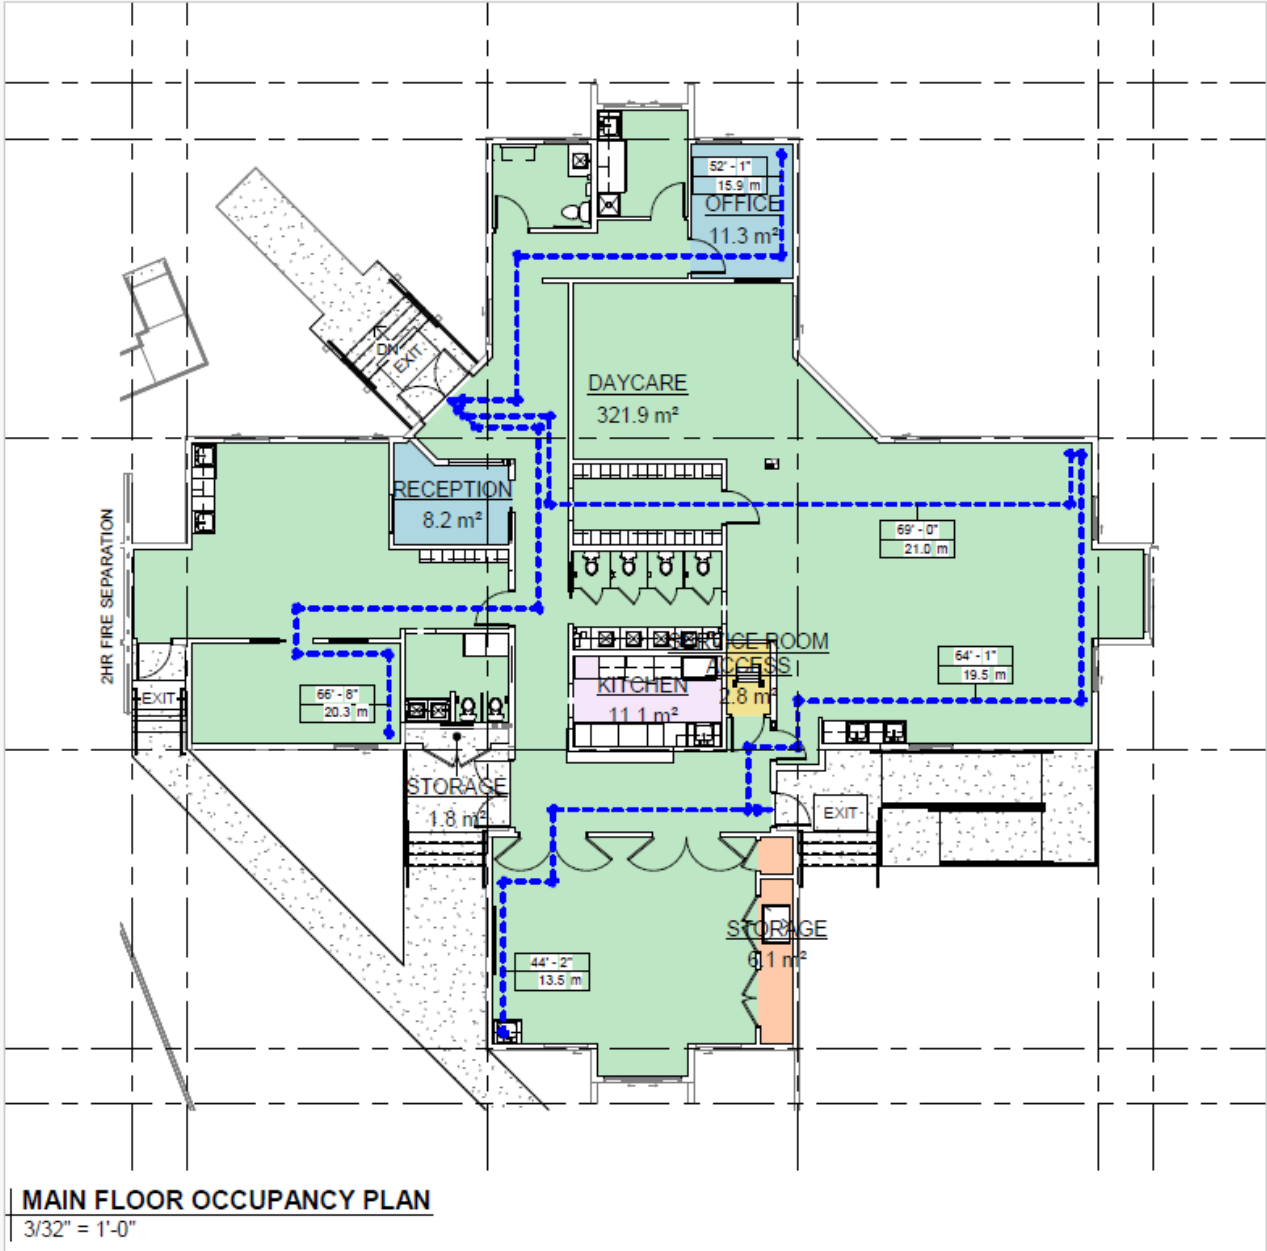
Floor plan of Boundary Bay Montessori School Building # 2
